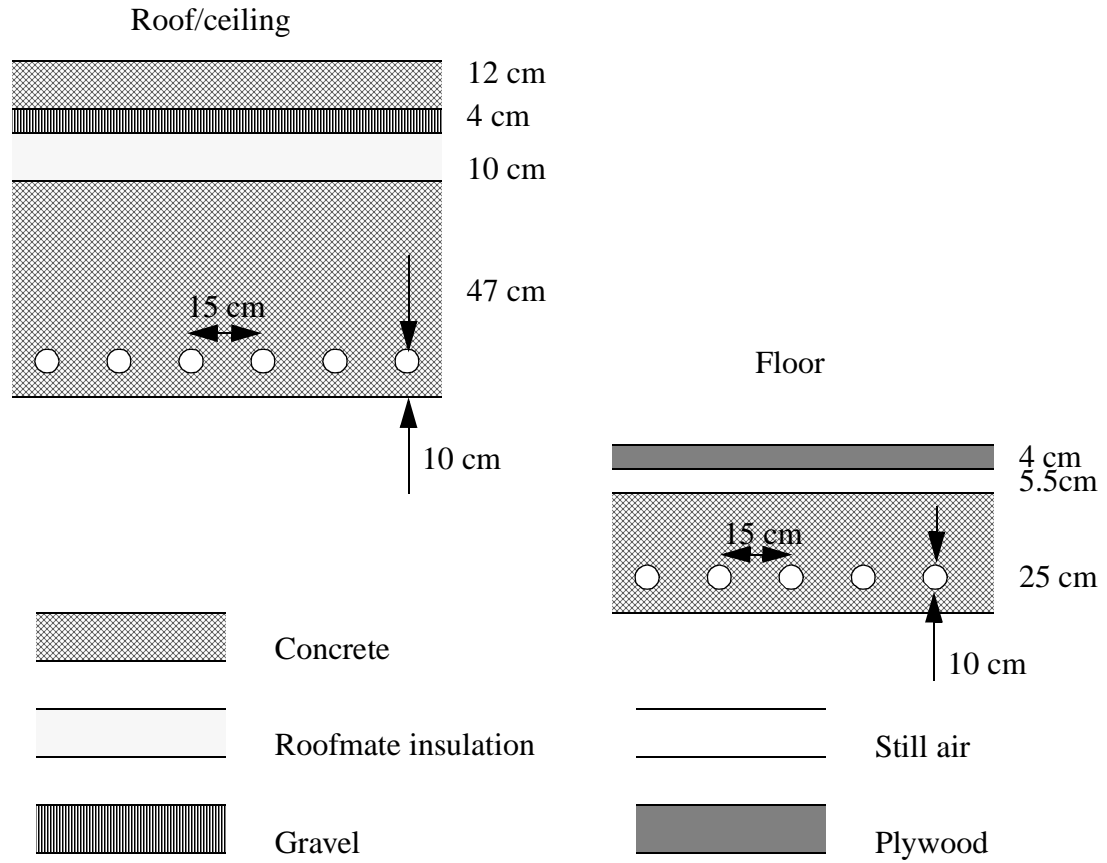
Roof and floor composition in the DOW-Chemicals test room.
